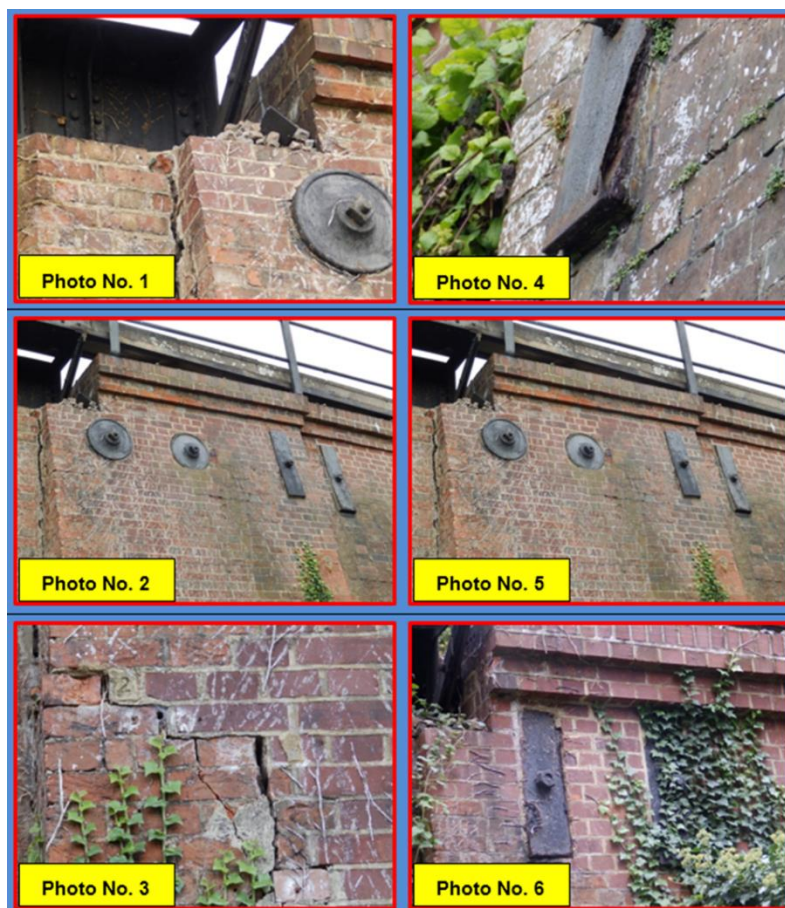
(b)Wing Wall/Abutment & Pattress Wall Plate Deterioration
